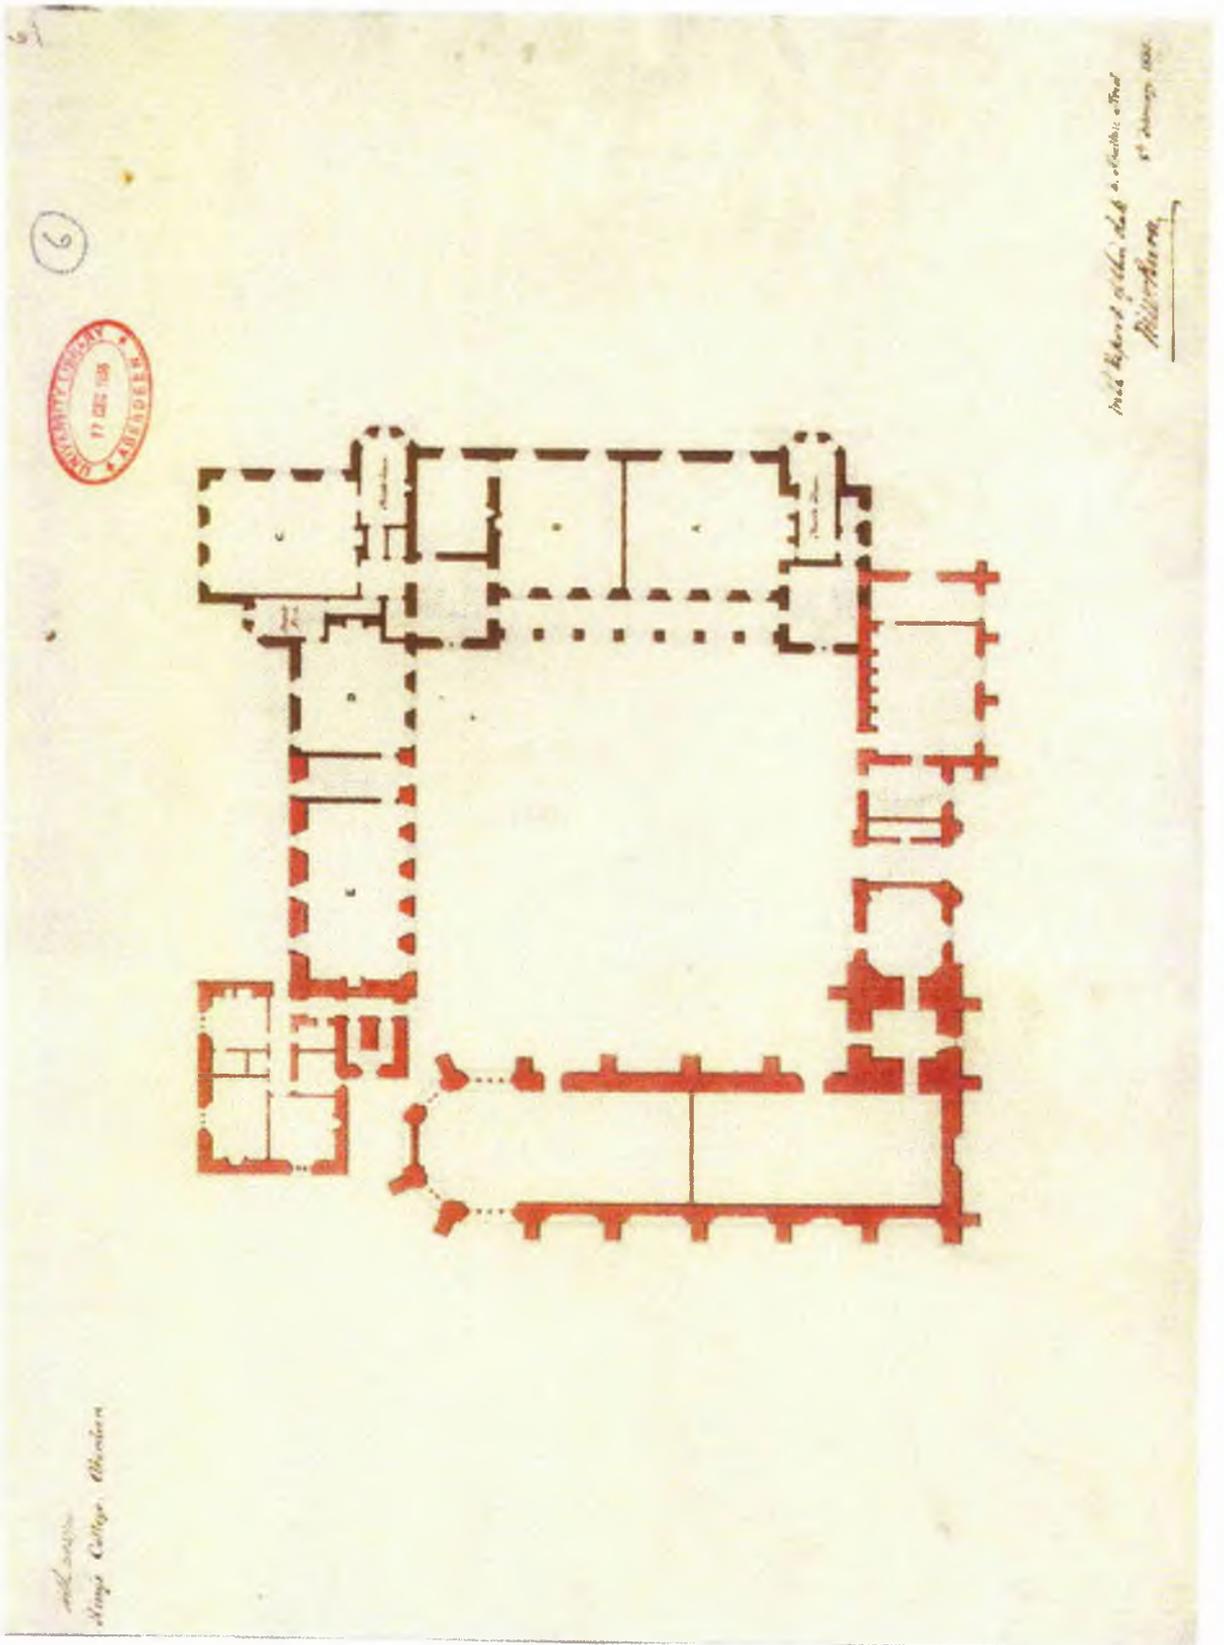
King's College. Ground floor plan. W. Burn 8th February, 1855.
